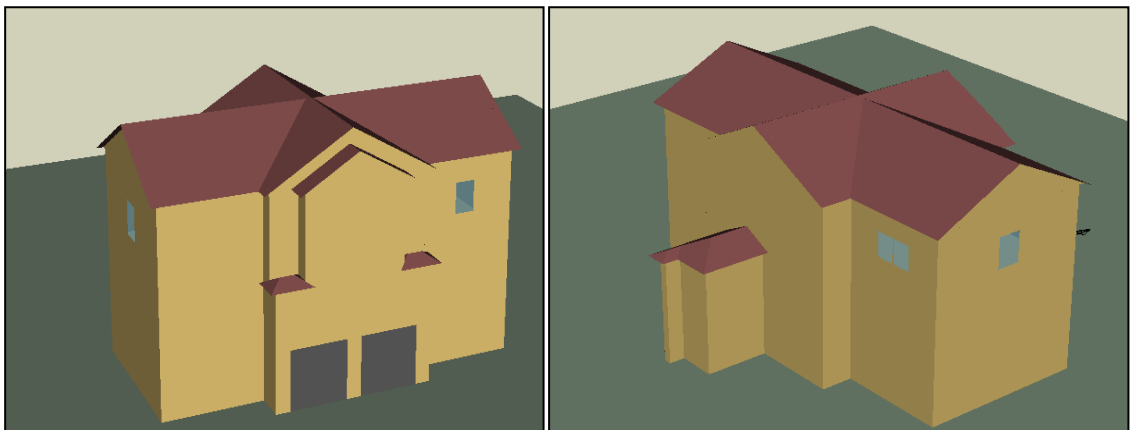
(a) House#2 Garage -Front side (b) House#2 Garage -back side
